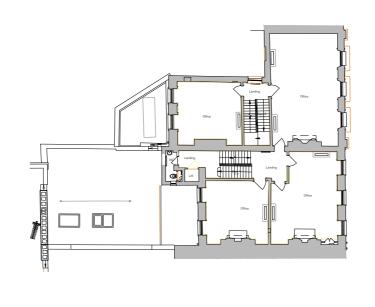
(Above, Left) - Basement Floor Plan, GA, as Proposed (Canaway Fleming Architects, 2012).
